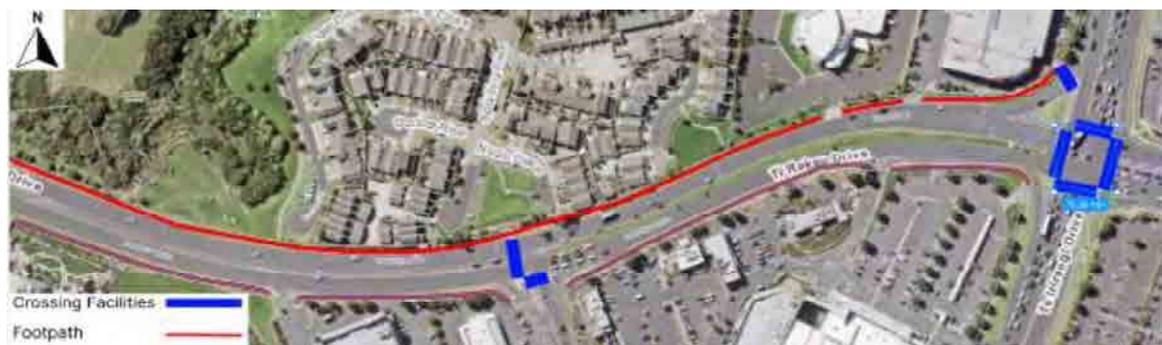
EB3C - Burswood Dr east to Guys Reserve existing walking facilities
